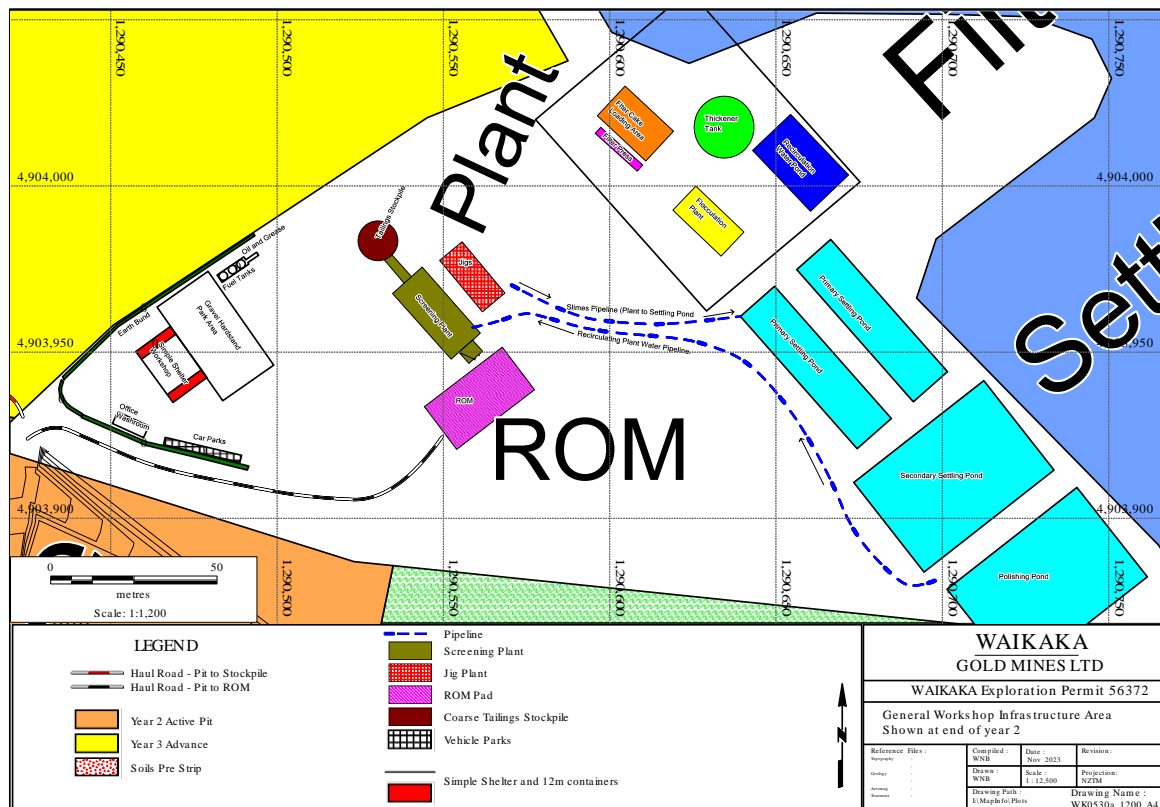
Mine Site Plan General Layout of Starter pit and plant location
